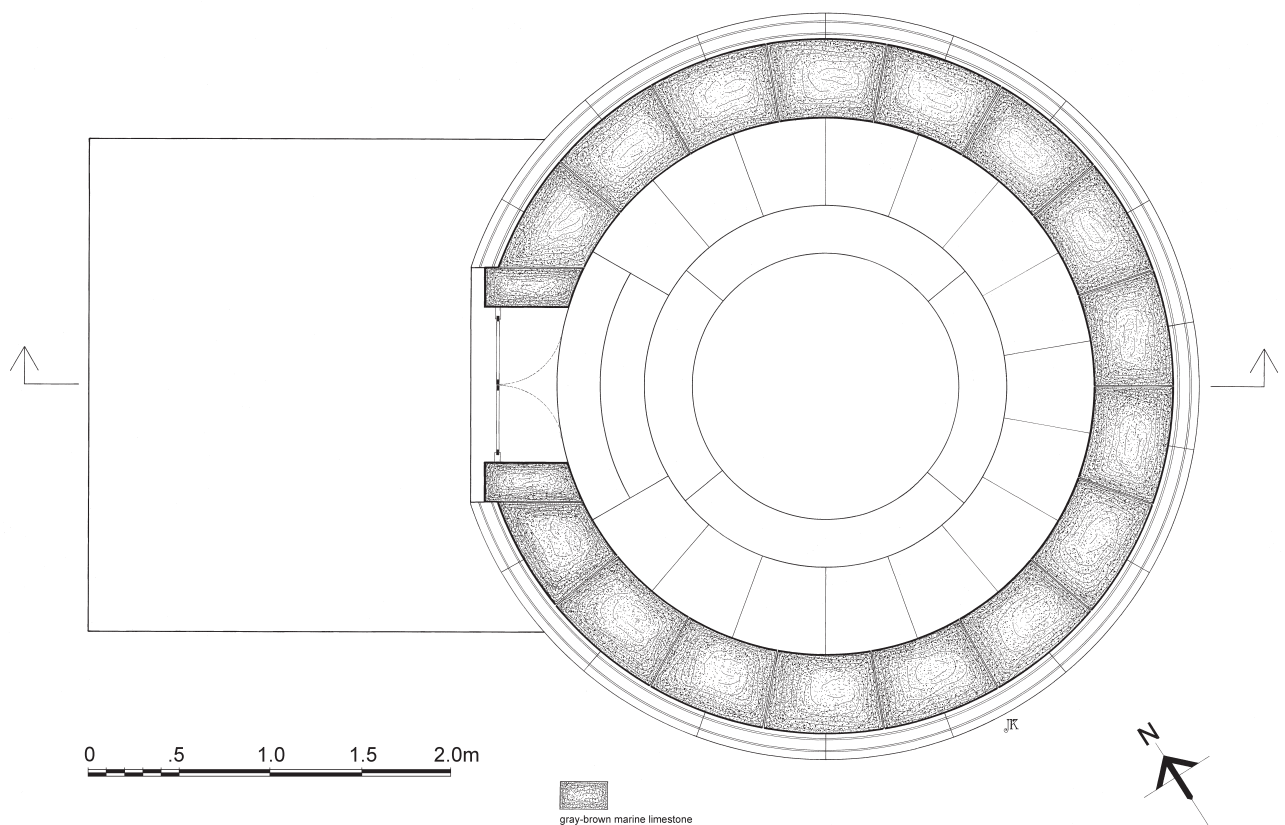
(*below*). Restored plan of the Doric Rotunda. Drawing John Kurtich.
